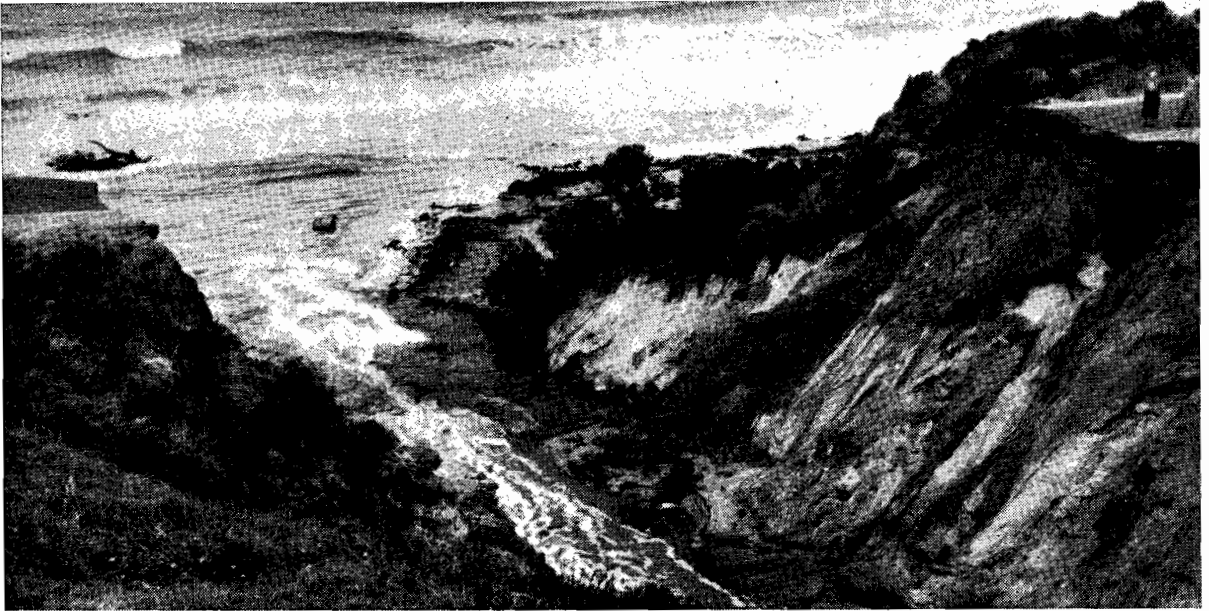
Roadway and culvert washed away by floodwaters.]
